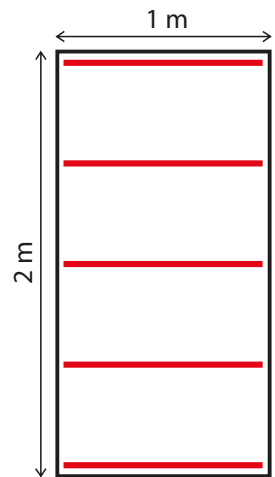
Fitting band installed in parallel to a 1 m wall.
